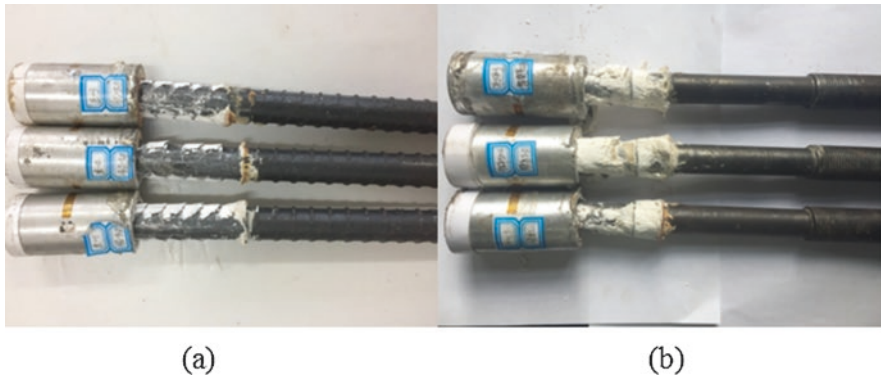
Post-tested specimens, (a) left spiral bolts; (b) soft rock bolts
